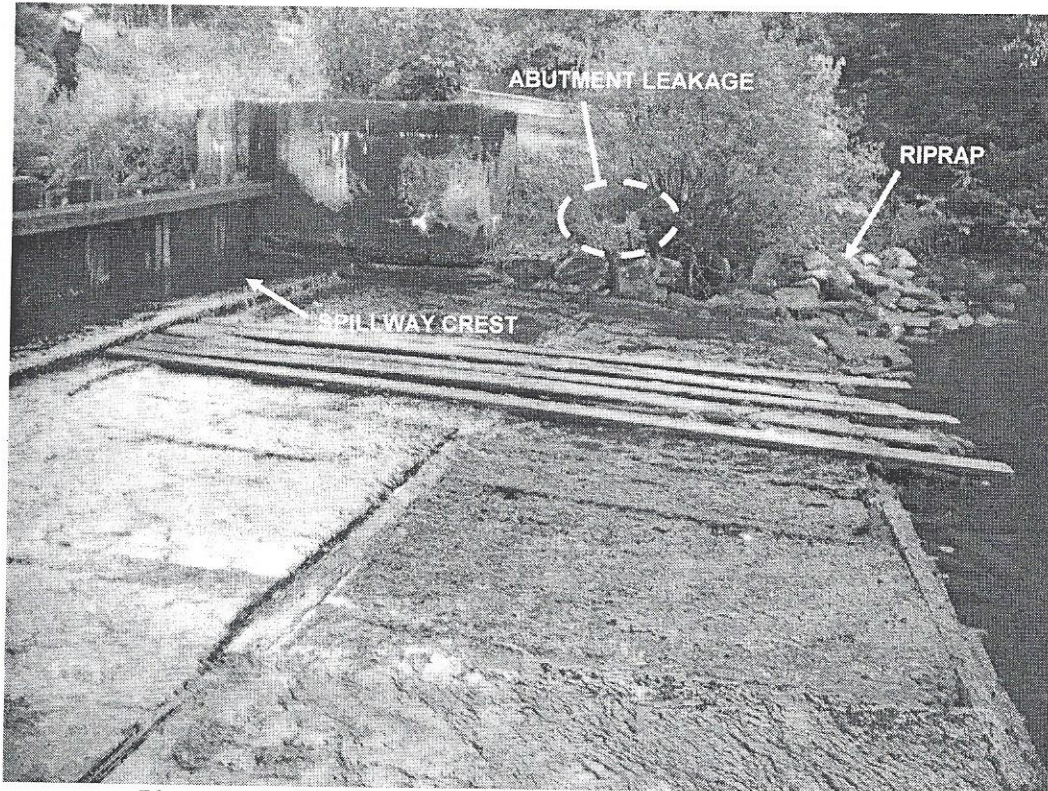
Left Spillway Bay: Crest, Apron and Abutment Wall.
